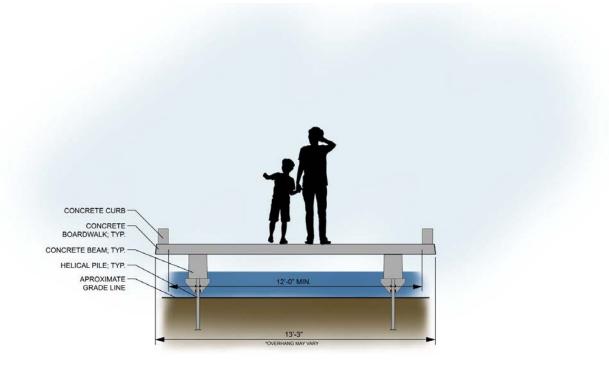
| Typical Concrete Boardwalk Conceptual Cross Section with Curbs
